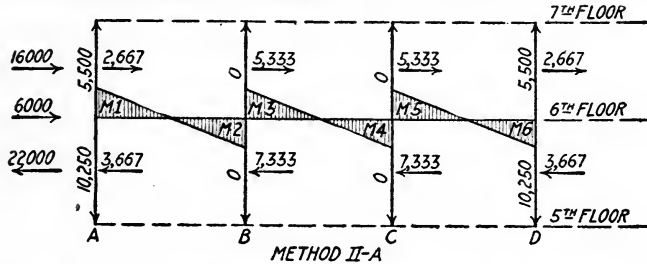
COLUMN-SHEARS AND GIRDER MOMENTS AT SIXTH FLOOR, CALCULATED BY METHOD II-A
